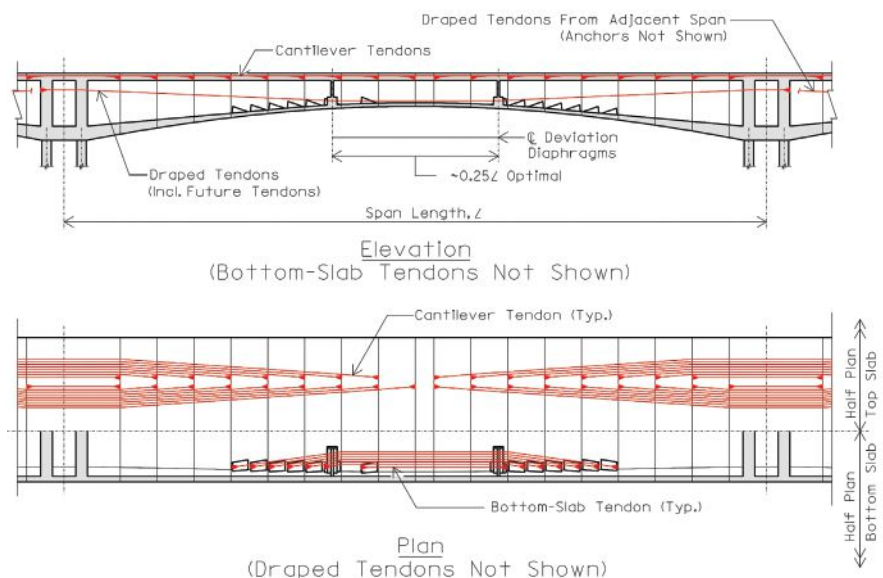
Typical post-tensioning layout for a variable-depth, balanced-cantilever bridge.
